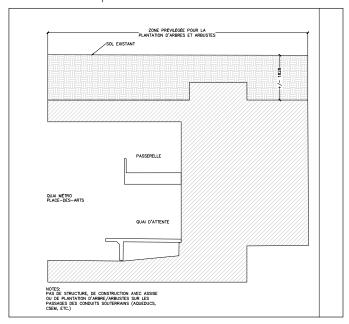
technical cross section of the new Place-des-Arts métro station elevator; clearance above the elevator is approximately 1.5 metres, and clearance above the tunnel is +/- 2 metres.
